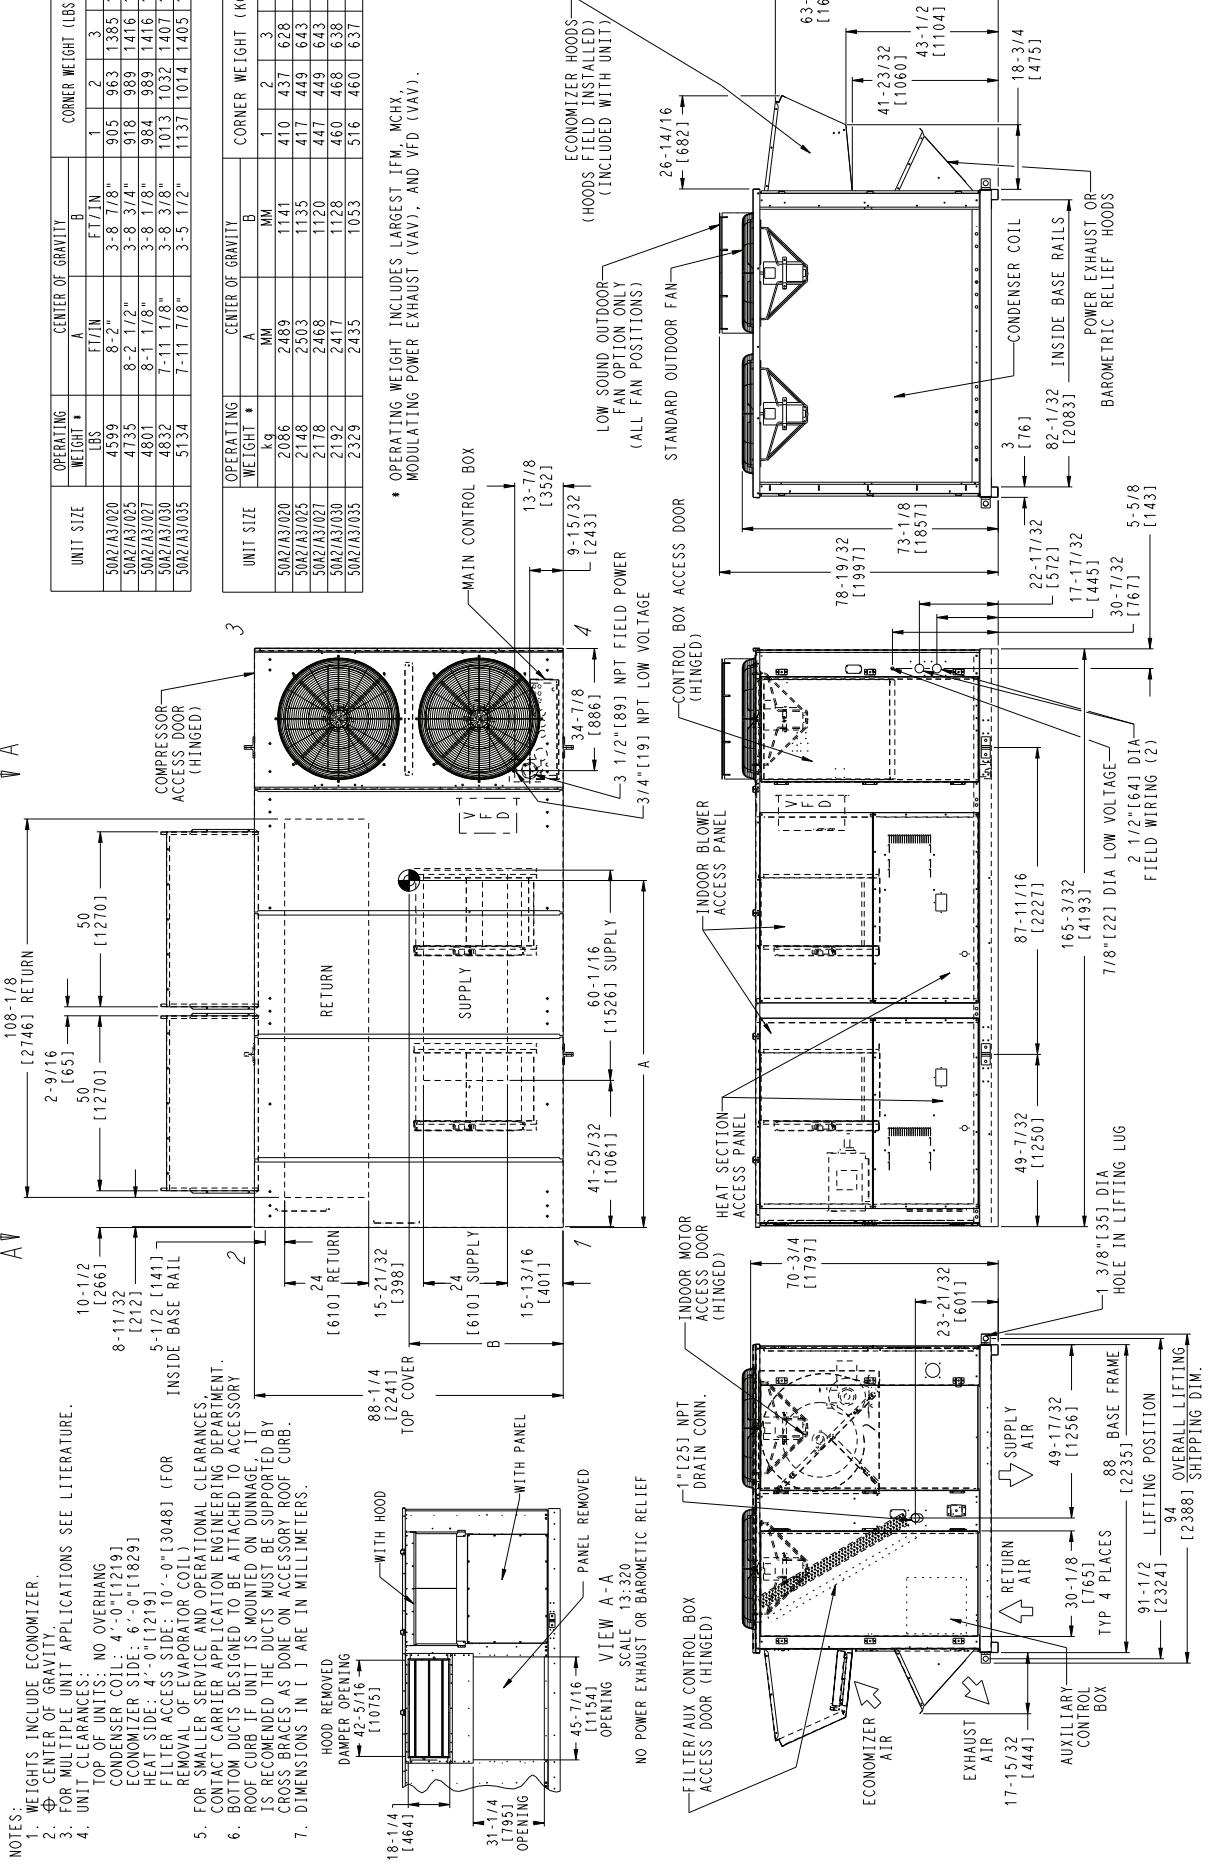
Base Unit Dimensions — 50A2,A3020-035
